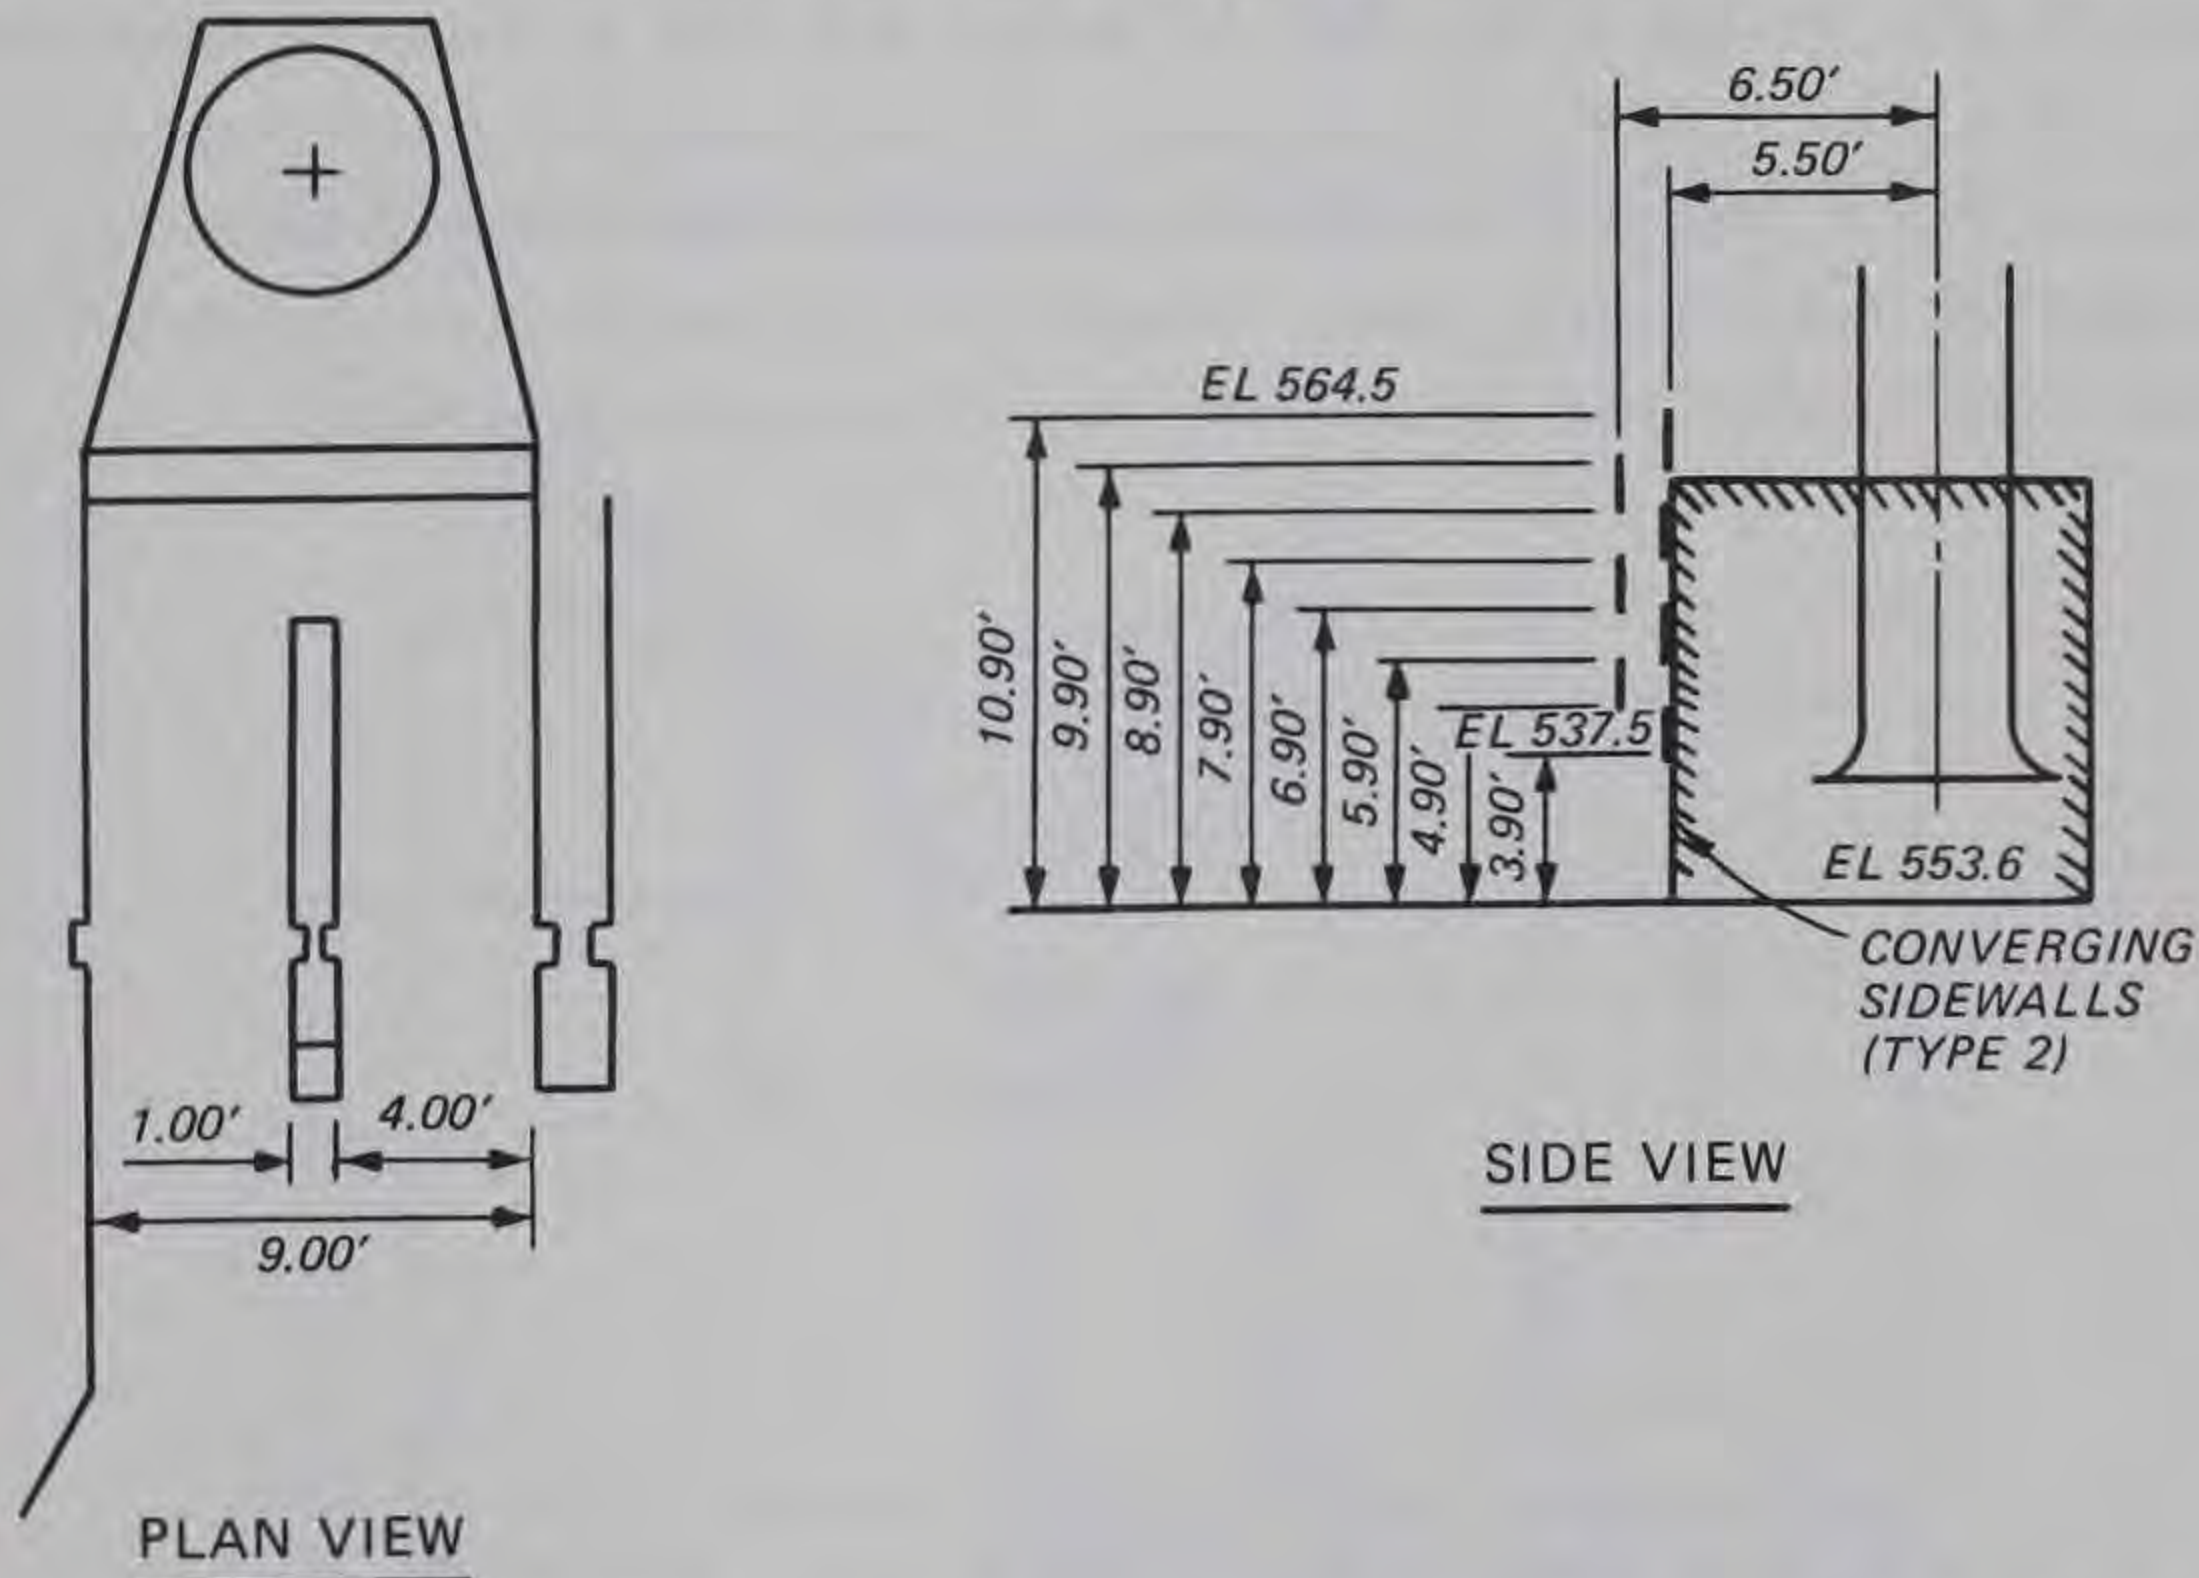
Type 2 design vortex suppressor beams with type 1 design guide vane and type 2 design sidewalls
